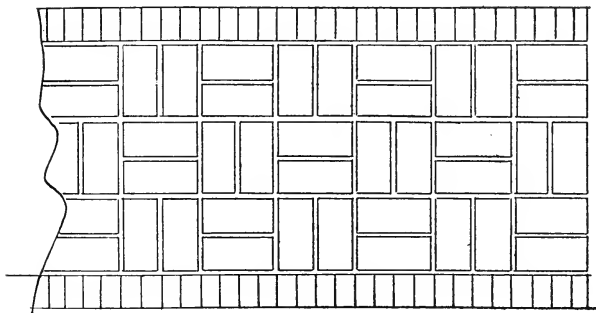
An attractive pattern for a brick walk best used for paths under six feet in width
